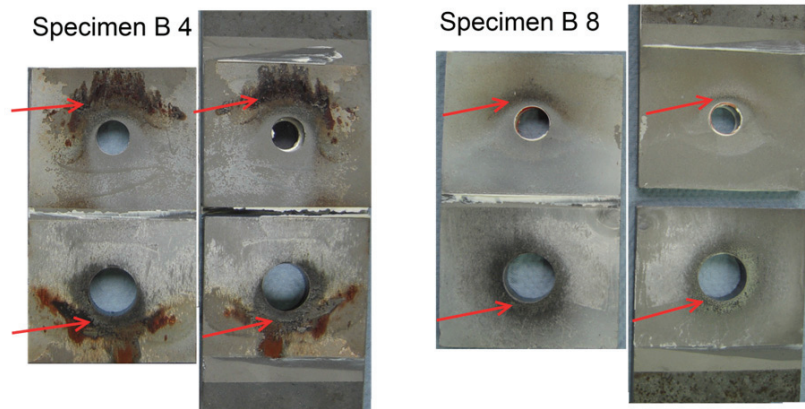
Specimens B 4 and B 8 after fatigue failure and disassembly.
